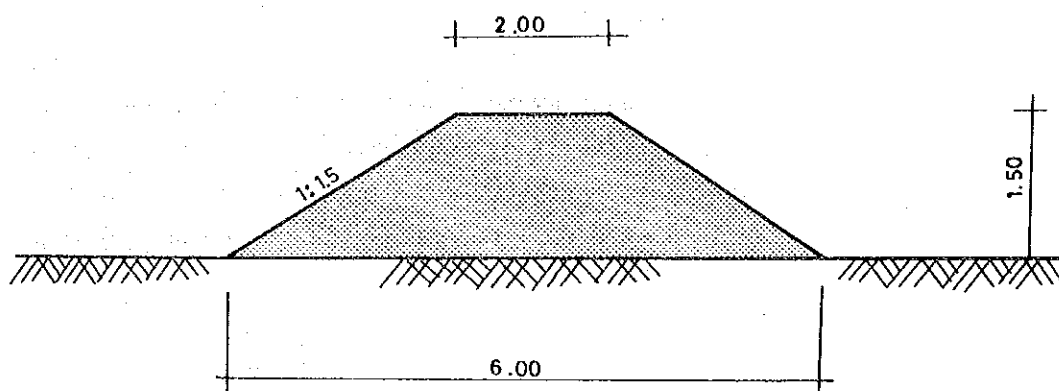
Typical Cross Section of Divider Drainage System
